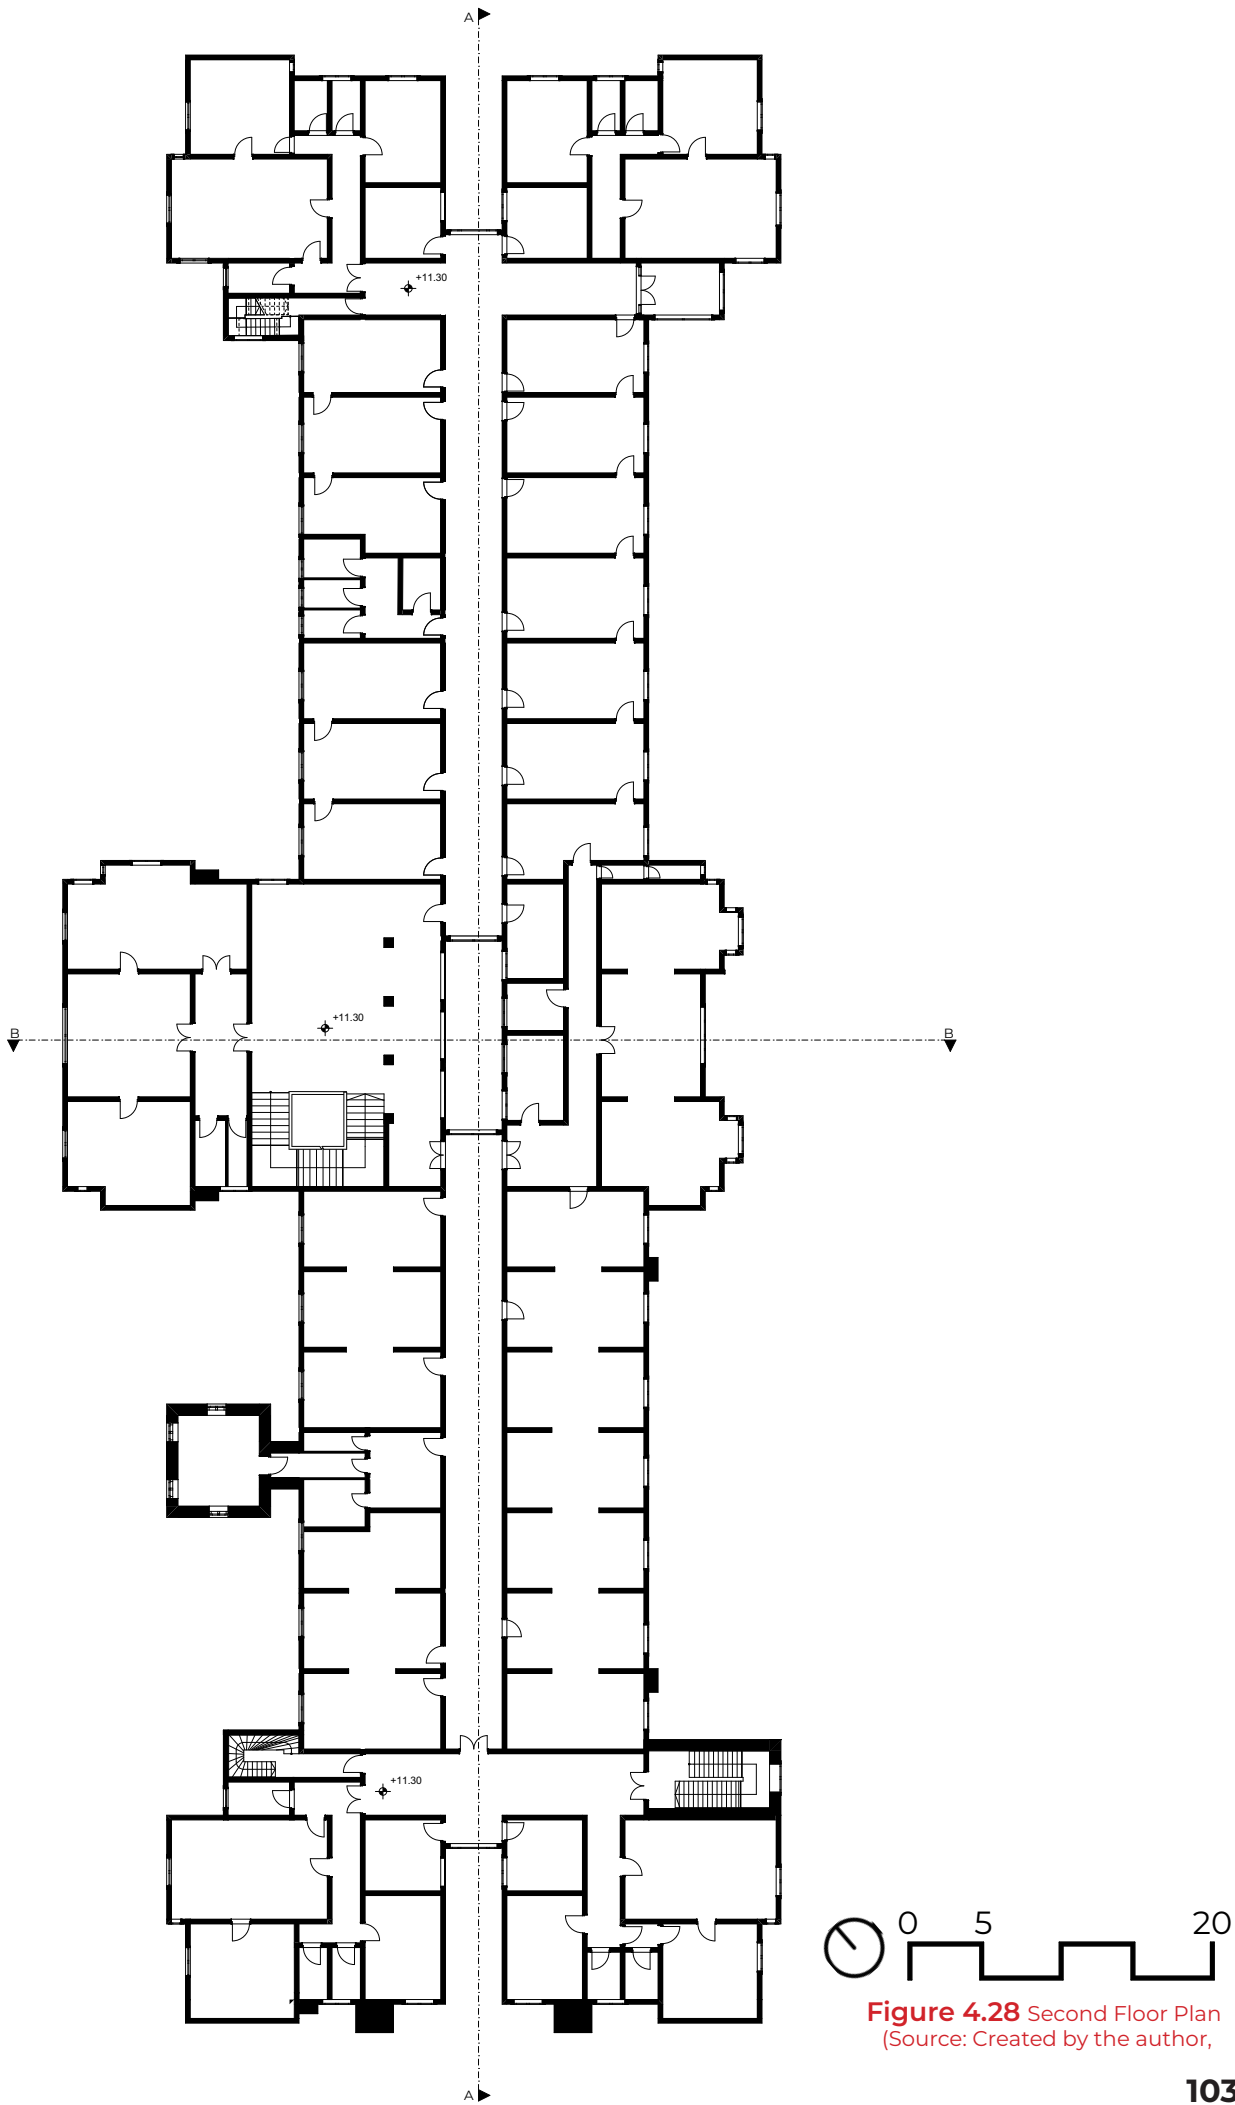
Second Floor Plan (Source: Created by the author, 2024)
